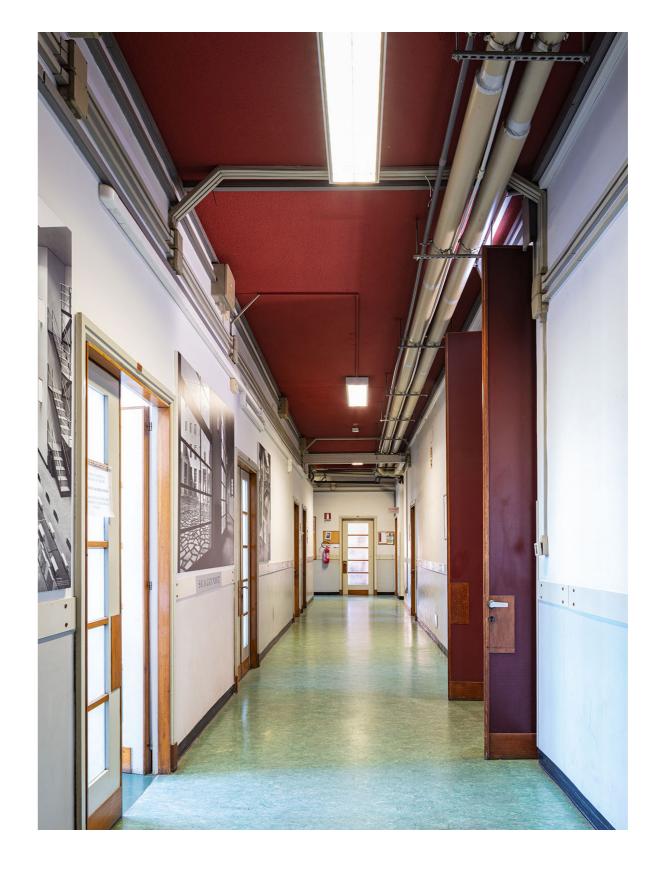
Front building, first floor, bundling of cables, ducts, and wiring in the office corridor (© Sardo 2021)
